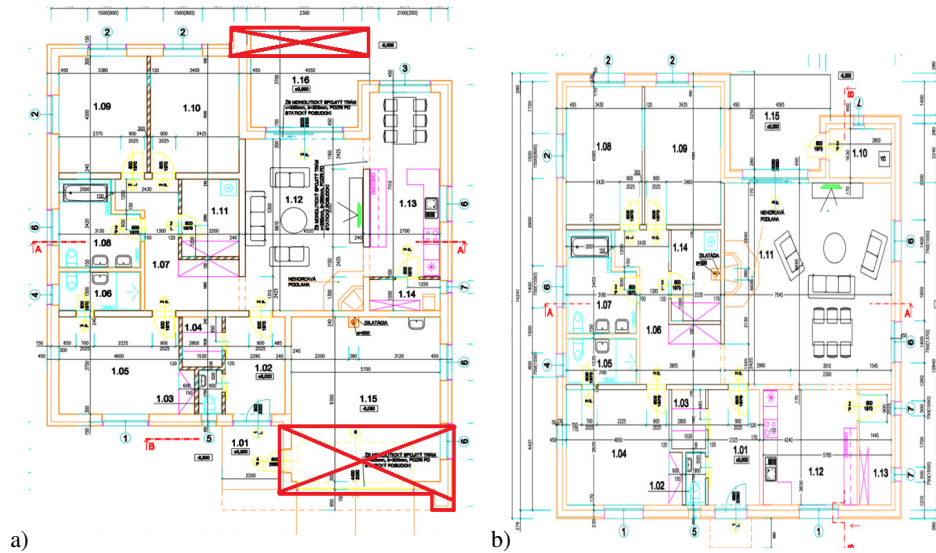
Ground floor of family house: a) Alternative 1; b) Alternative 2
